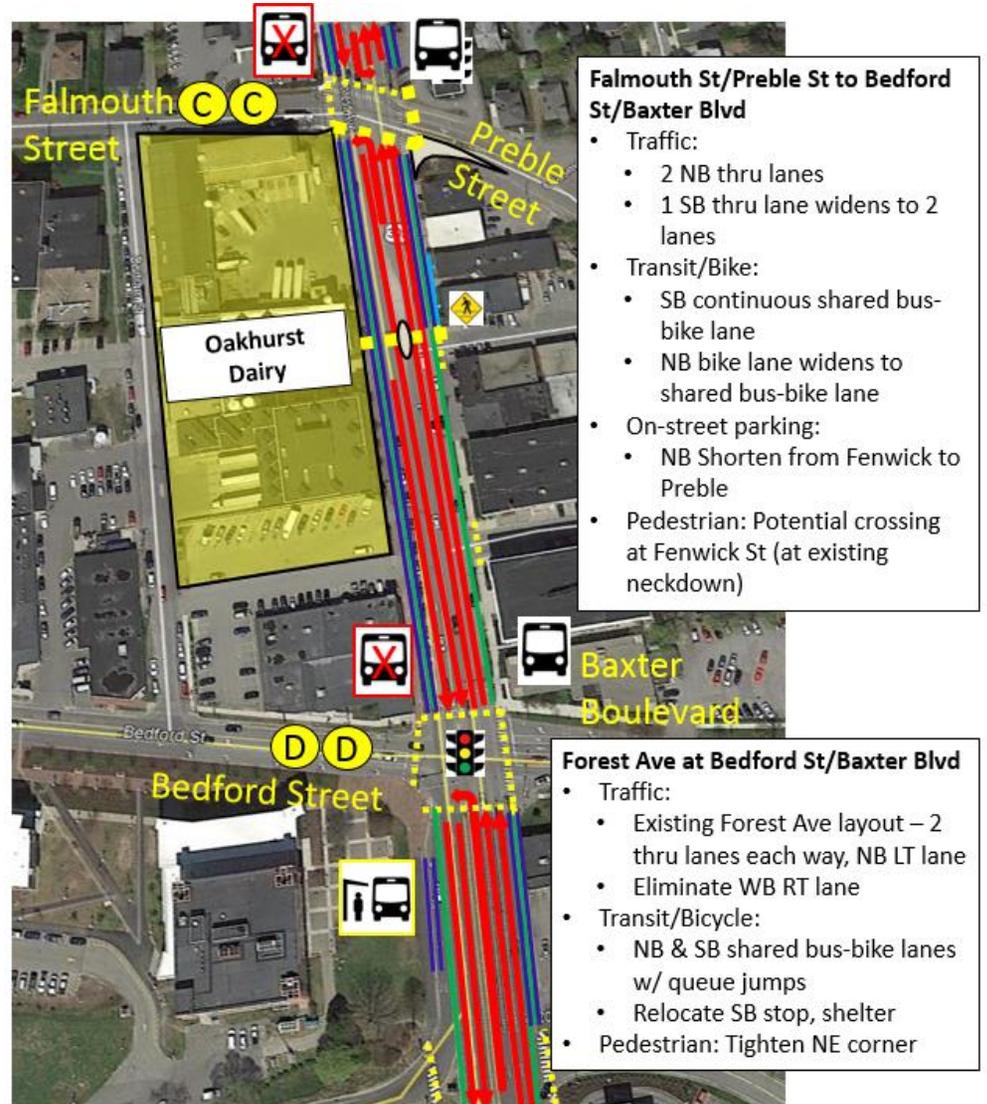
Falmouth Street/Preble Street to Bedford Street/Baxter Boulevard – Alternative 2
